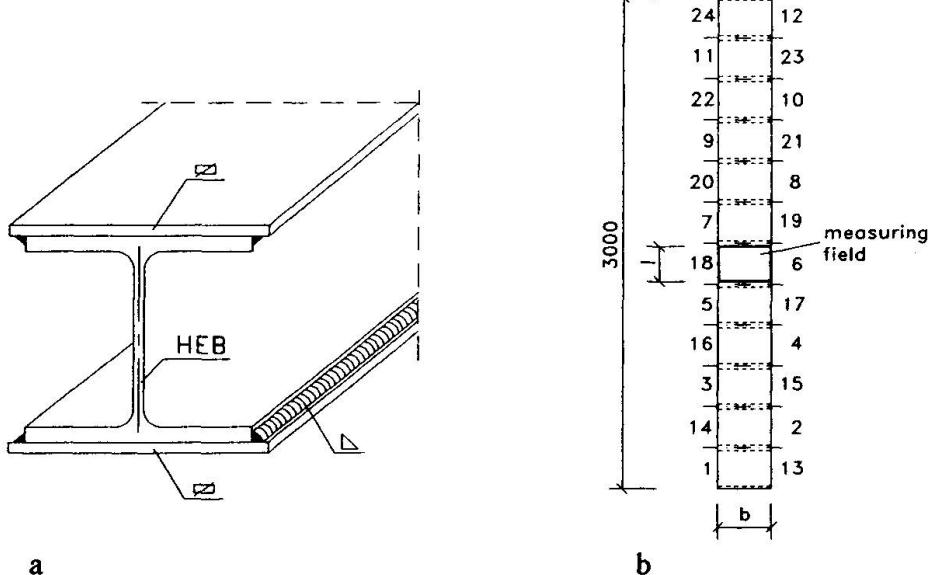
Test specimen. a Perspective, b Top view, measuring field and welding sequence
